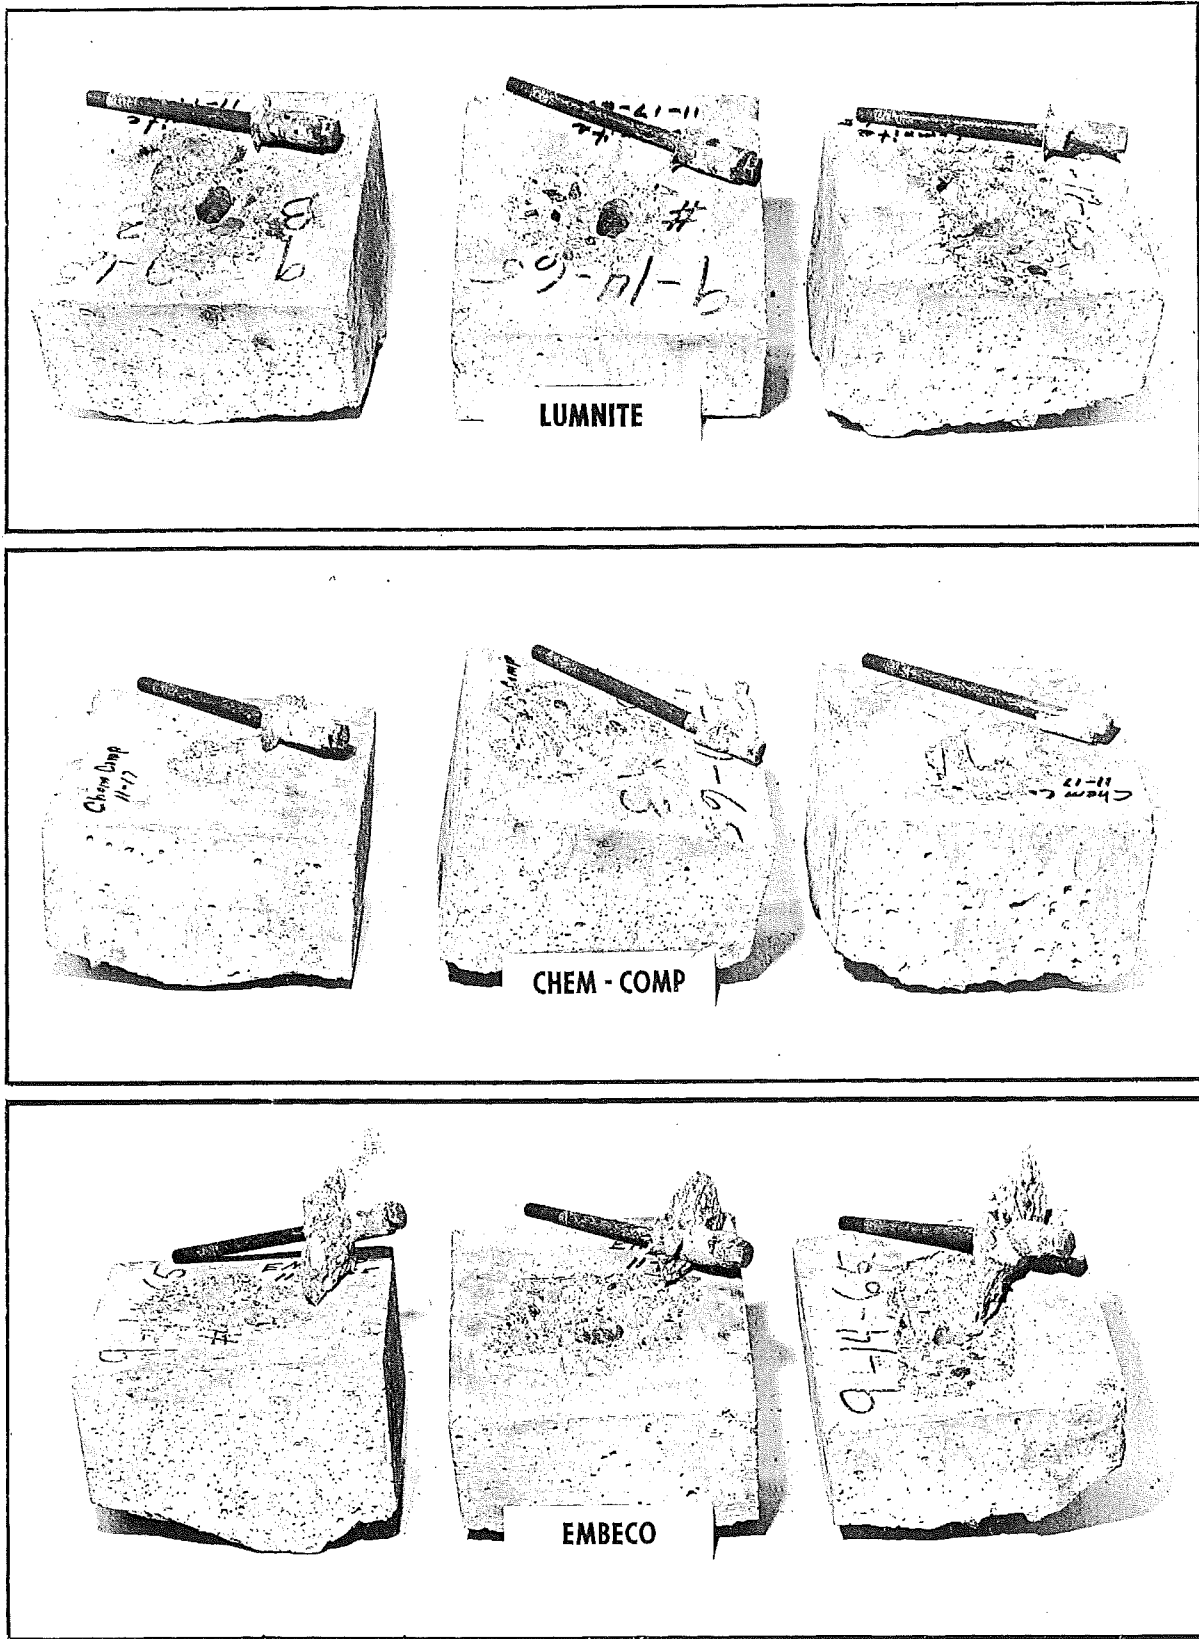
Samples after pull-out (1/2-in. diam bolts, 2-1/2-in. deep in 1-in. ND holes).
